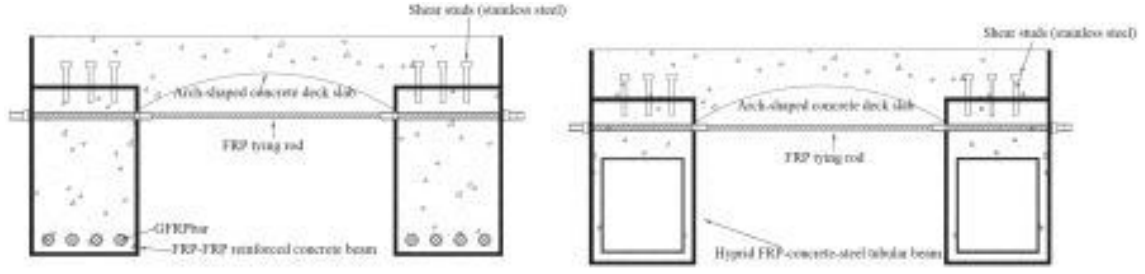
Cross-section of hybrid GFRP-concrete deck systems [63].
